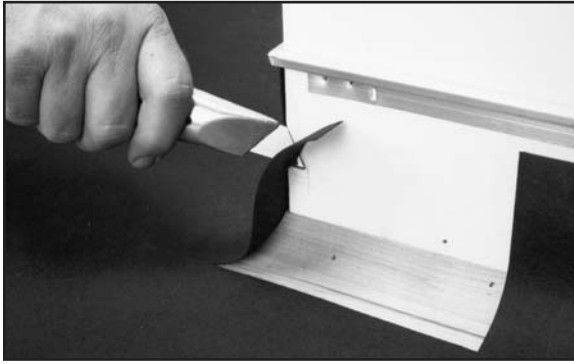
Pattern felt must be held tightly against cove fillet strip and continue up wall to 1/4" (6.4mm) below cap trim.
